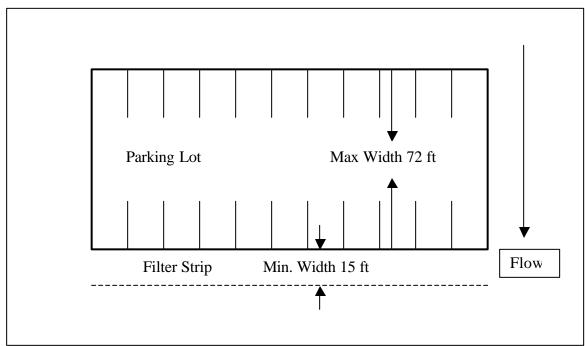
Example Configuration of Filter Strip adjacent to Parking Lot
